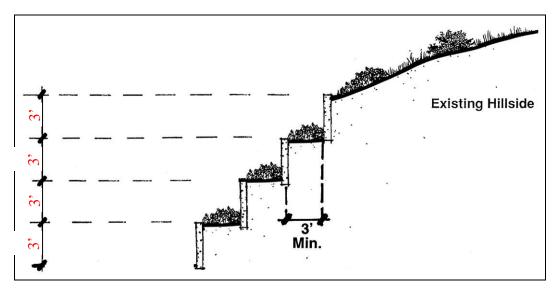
Retaining Walls Along Streets and in Setbacks
